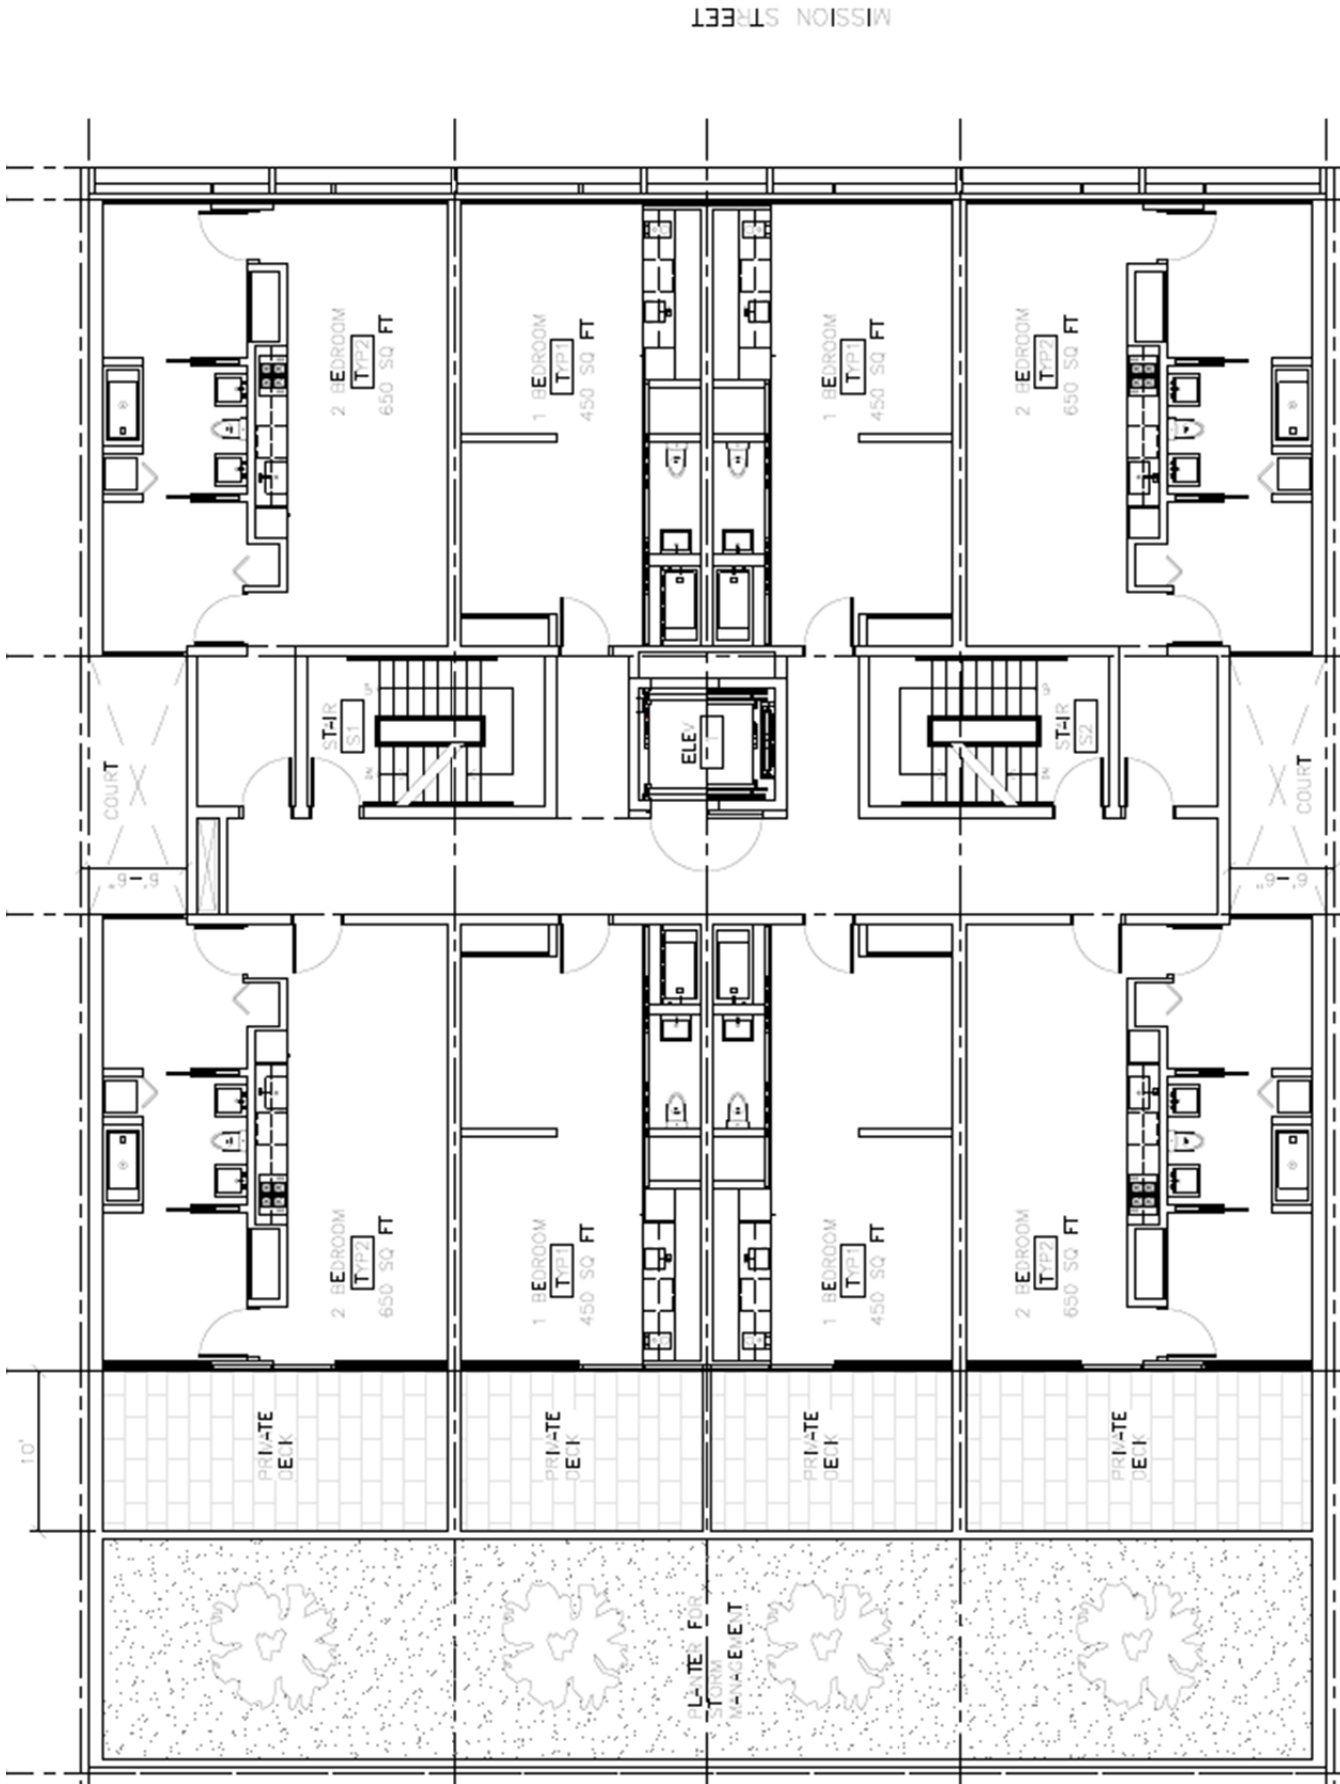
PROPOSED SECOND FLOOR PLAN
